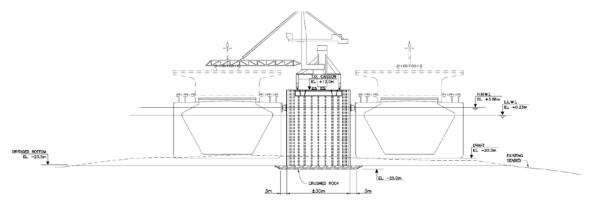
Elevation, Sandwell/AMEC Case for Steensby Ore Dock (see Appendix A)
